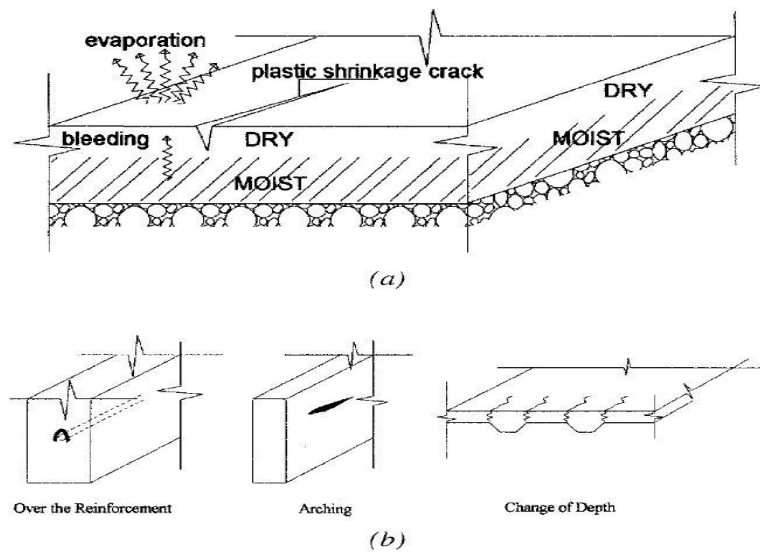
Plastic shrinkage cracking at the surface of concrete flatwork: (a) Surface Plastic shrinkage crack; and (b) plastic settlement cracks (Soroushian, 1998)
